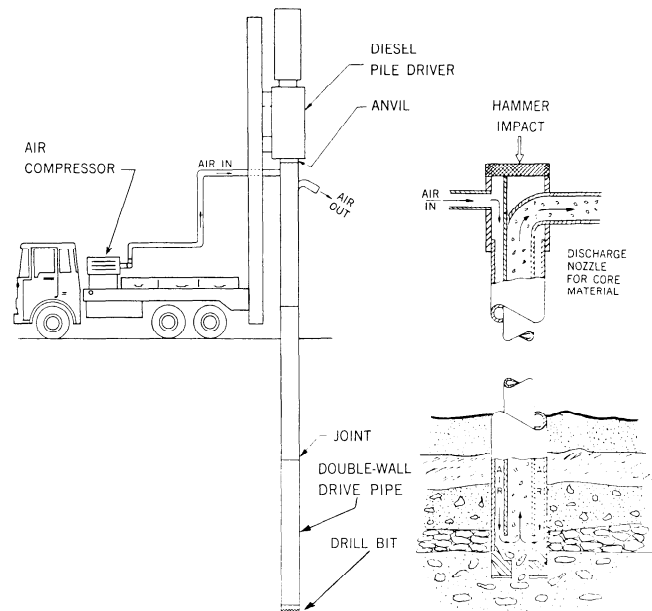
Becker hammer drill. (By permission of Becker Manufacturing and Drilling Inc.)
